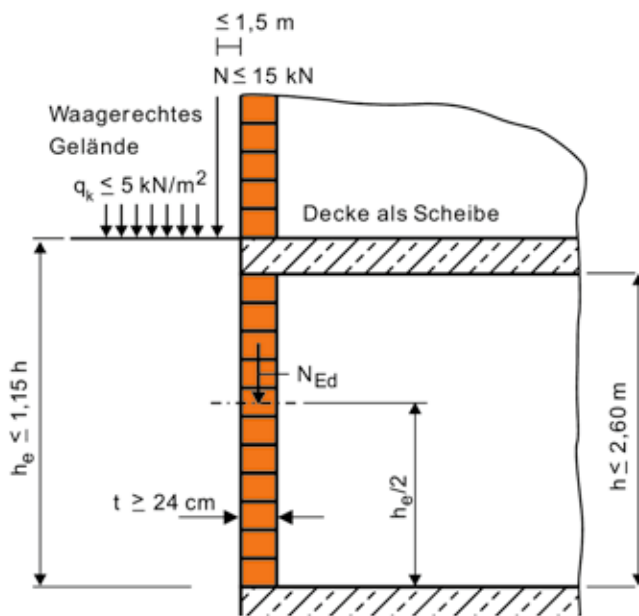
Boundary conditions for the simplified white of a basement outer wall
